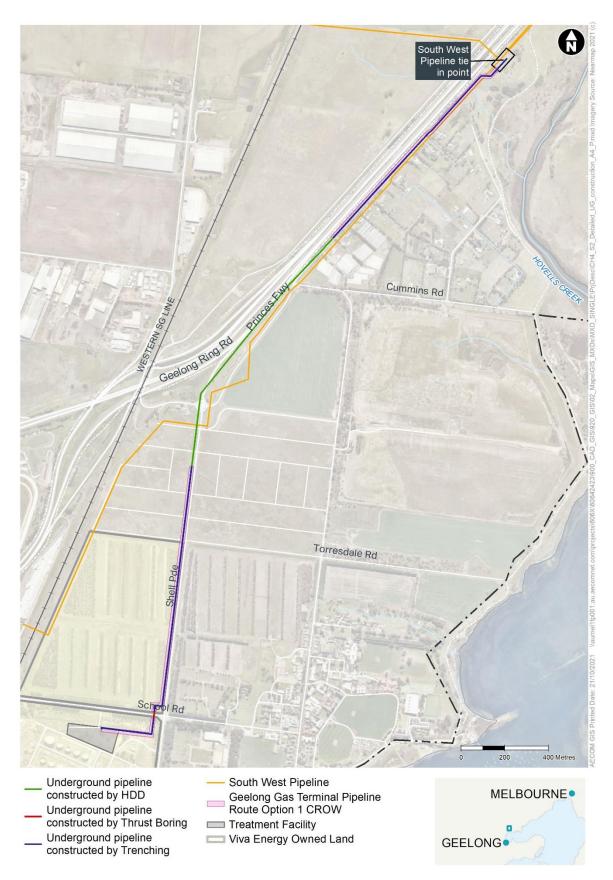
Proposed location of trenching construction techniques for the underground pipeline including open trenching, HDD and thrust boring
